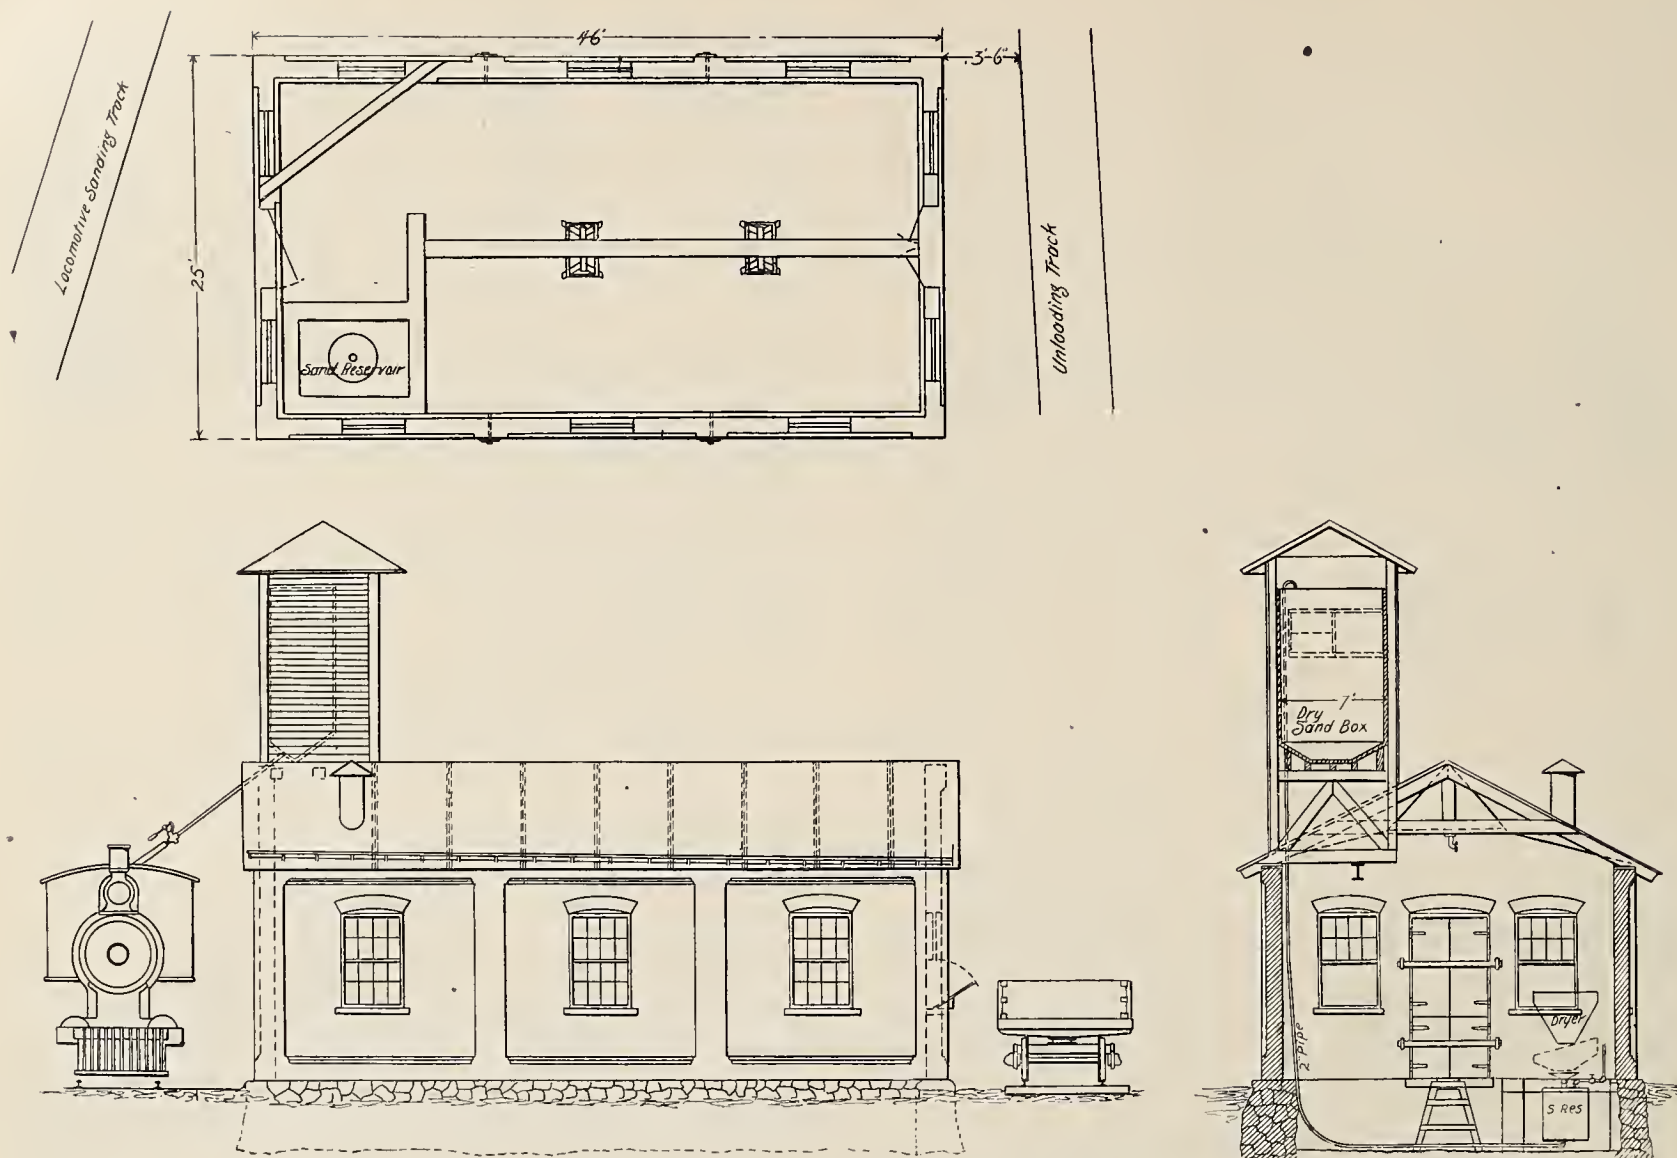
SAND STORAGE HOUSE—N. Y. O. & W.
